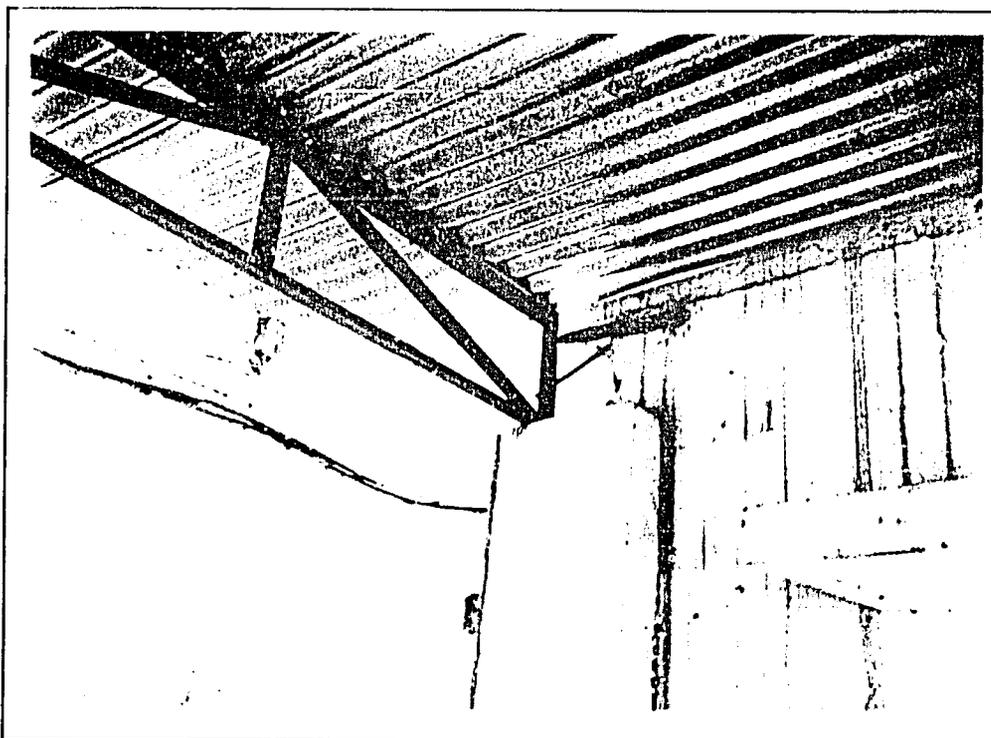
Peshawar MSH Office Facility. Detail of roof support girder at Field Operations building.
